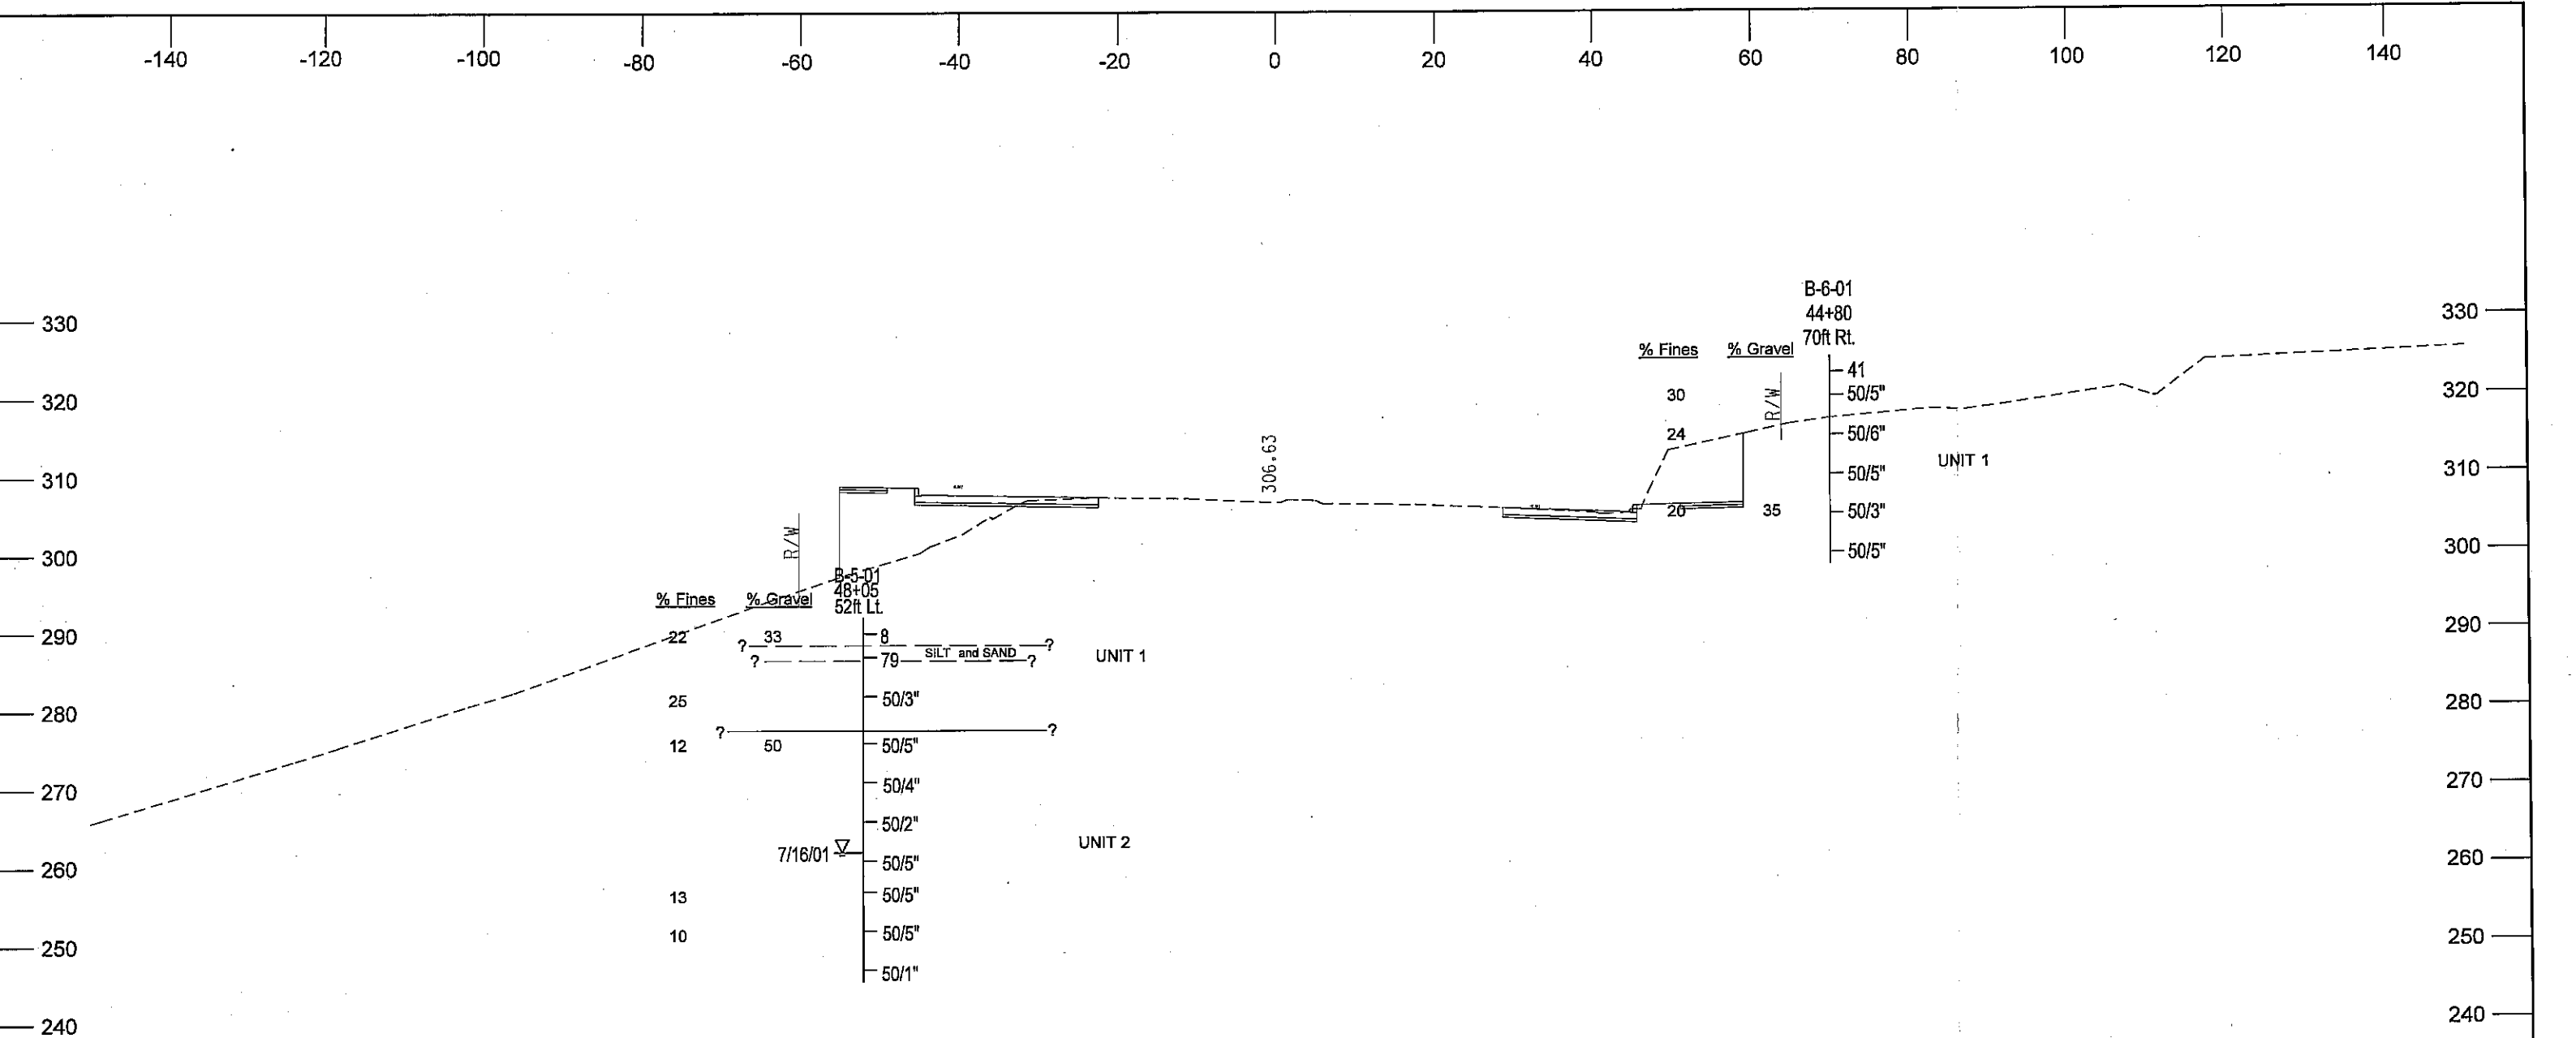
Generalized Soil Profile for Wall 5B and Wall 6
